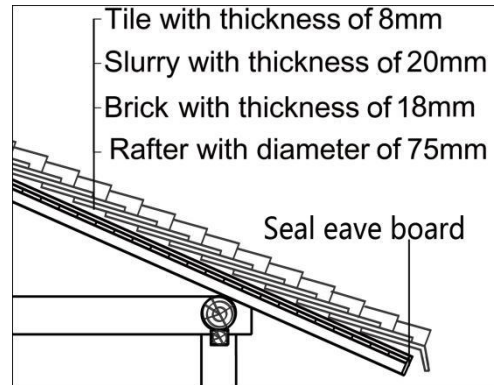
Schematic of the roof construction in traditional dwelling
